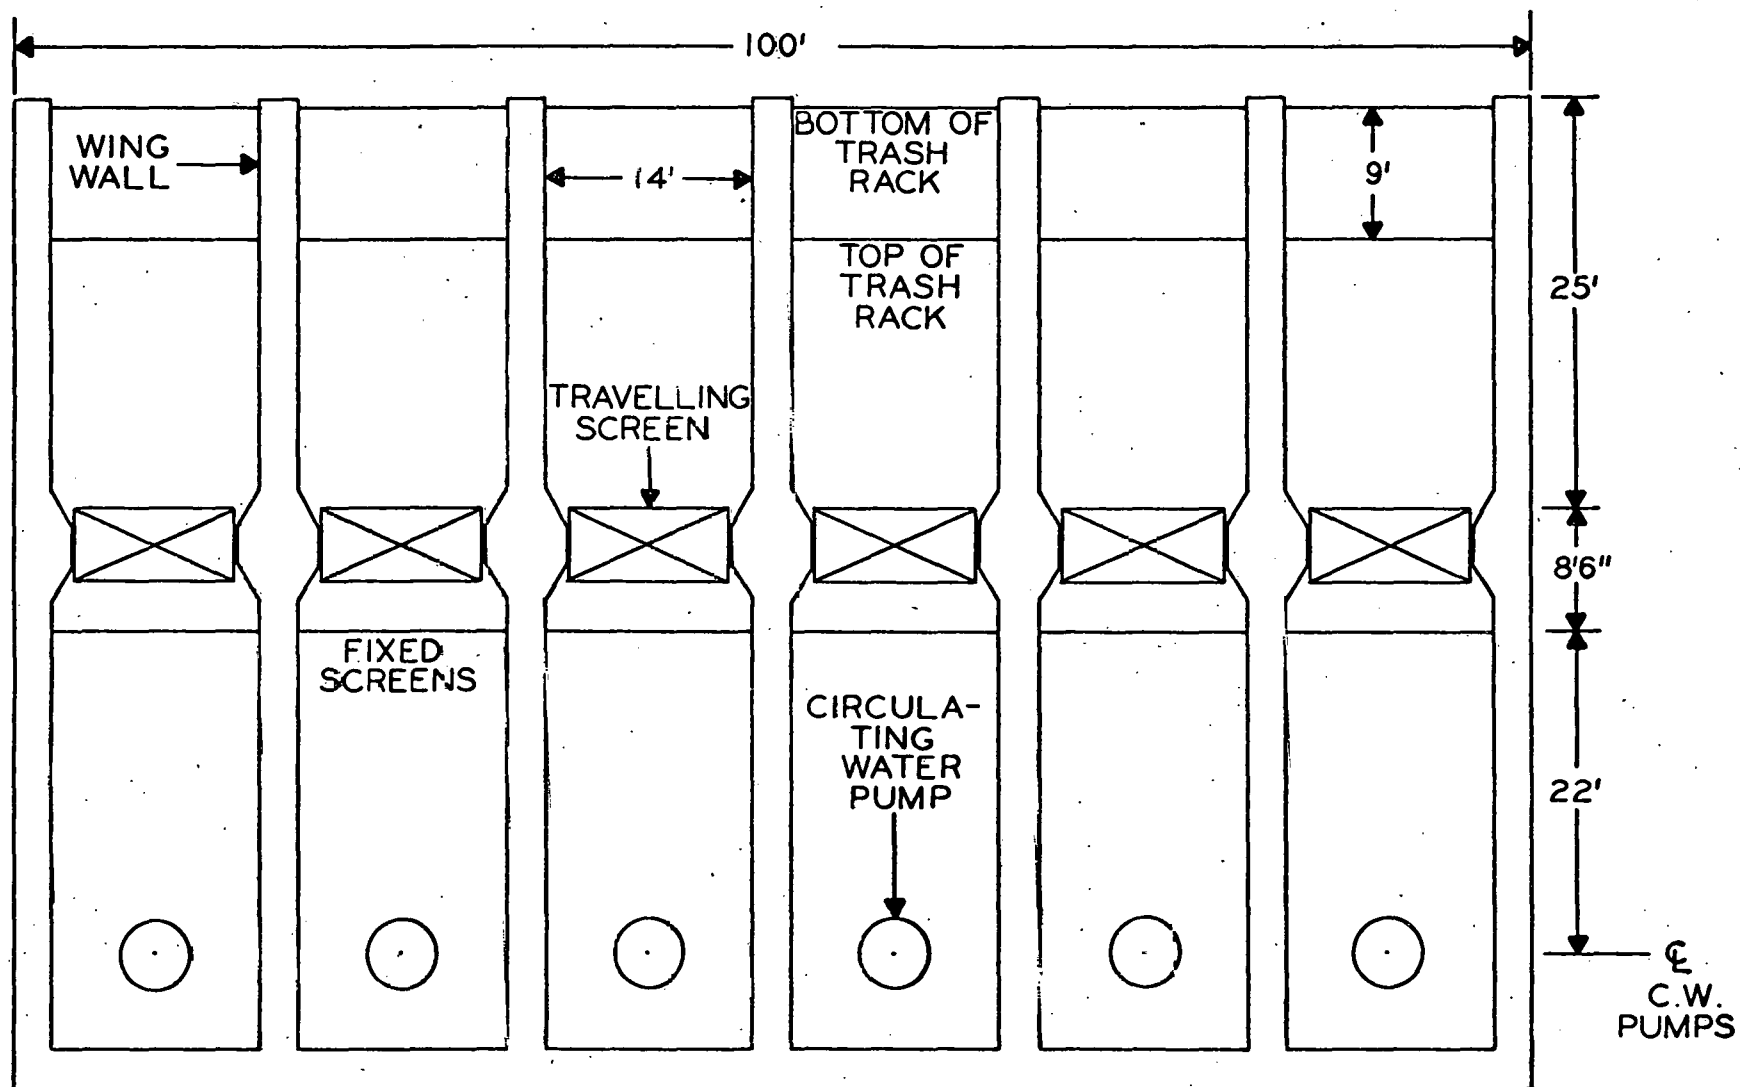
Intake Structure for Units 1 and 2, Plan View.
